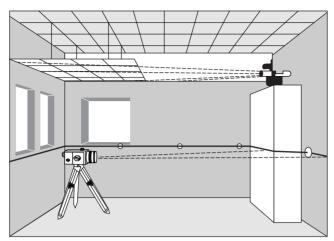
The laser level can be used for indoor or outdoor leveling of floors, stairs, slopes, drains, and ceilings, and mold-ings around the room. (*Courtesy of Stabila*)
